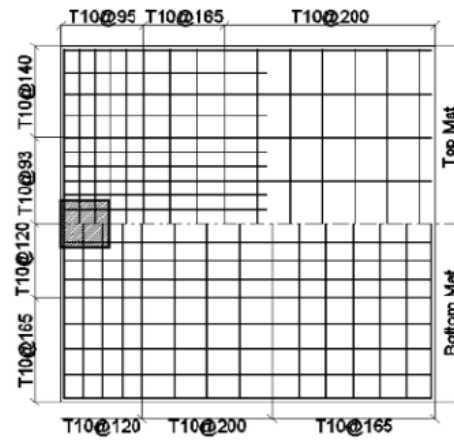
Layout of slab reinforcement for specimen SRR2.
